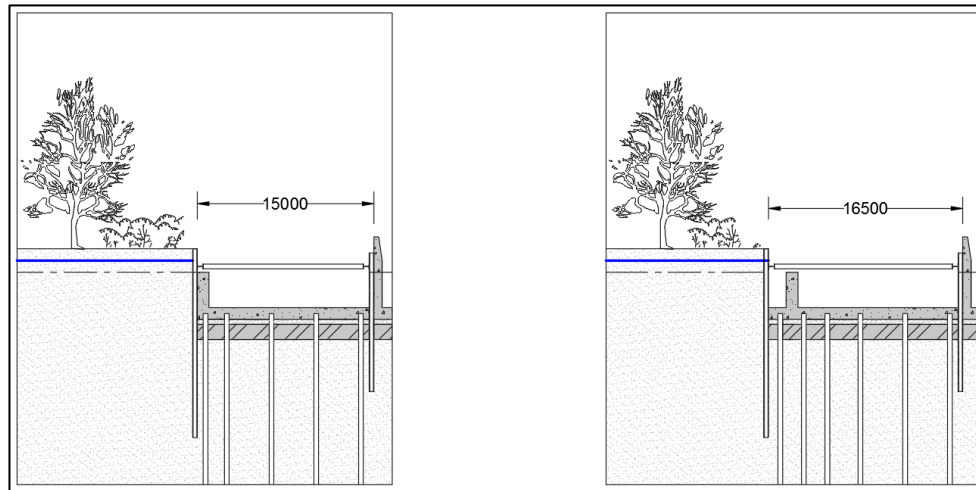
Difference between a normal piled foundation and a strip foundation with extra piles.
